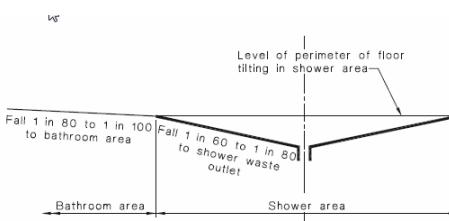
GRADES FOR BATHROOM AND SHOWER FLOORS
